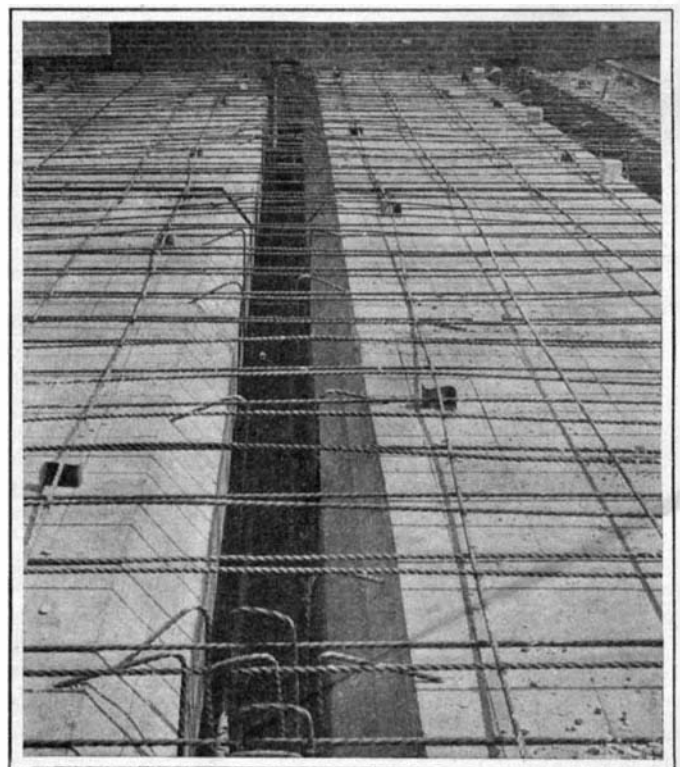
Wood Centering and Ransome Steel Bars for 50-foot Floor Span.
